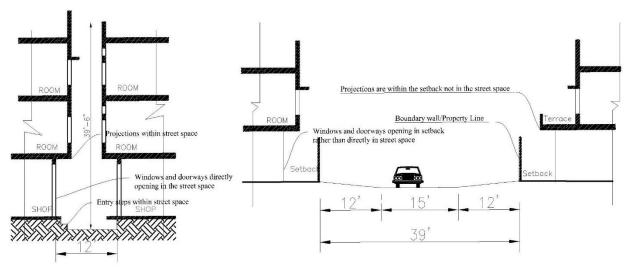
a) Section of a traditional street without any setback where windows openings and house projections are directly into street space. b) Section of a Bye-Law Street where boundary walls are blank, and windows open in the setbacks behind the boundary wall. Source: author
